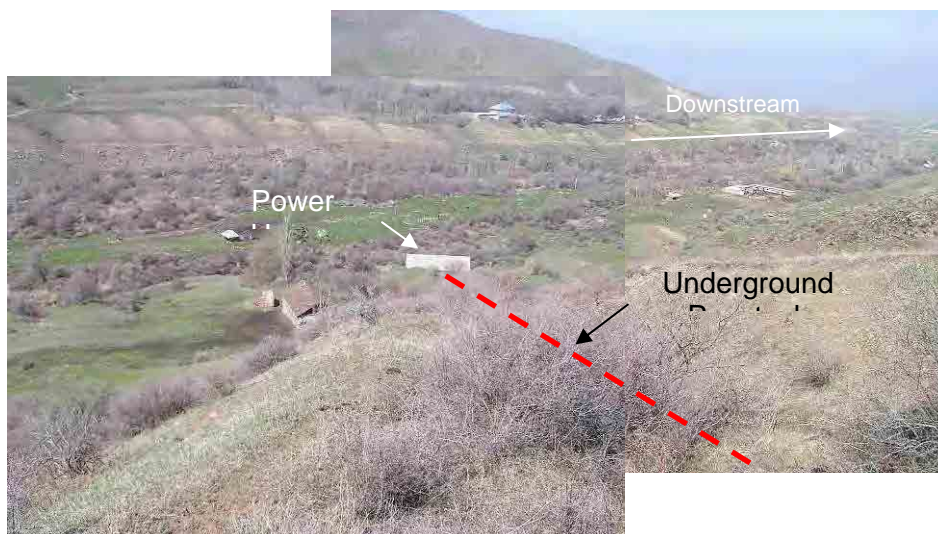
Slope for Embedded Penstock (seen from head tank)
